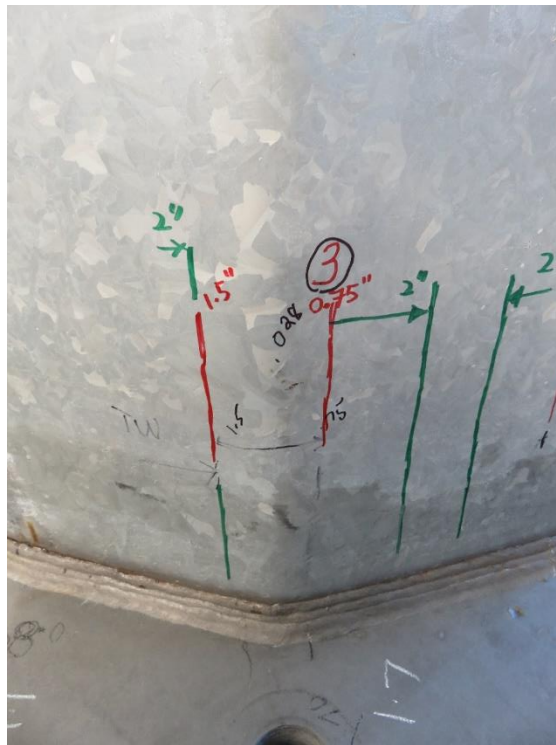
State of Cracks: Specimen 33-3-12-TX-A2 – Bend 3
